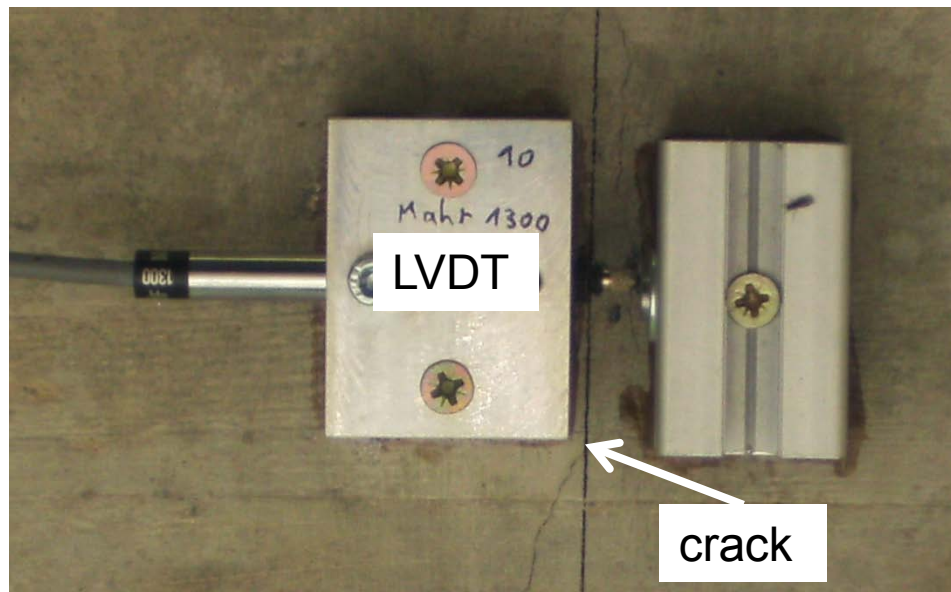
LVDT-sensor installed underneath the bridge and existing crack in the bridge structure
